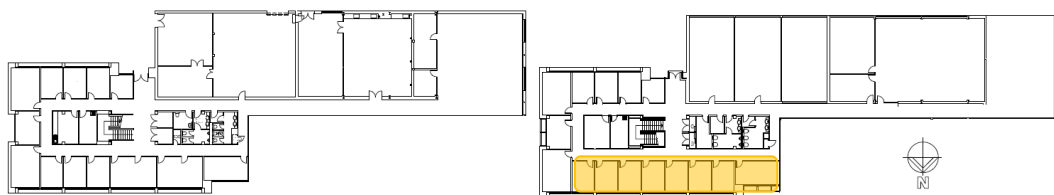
Floor plans of the ground (left) and first floor (right) of the modelled east wing of Building 4 with the investigated offices for retrofitting highlighted in yellow.
